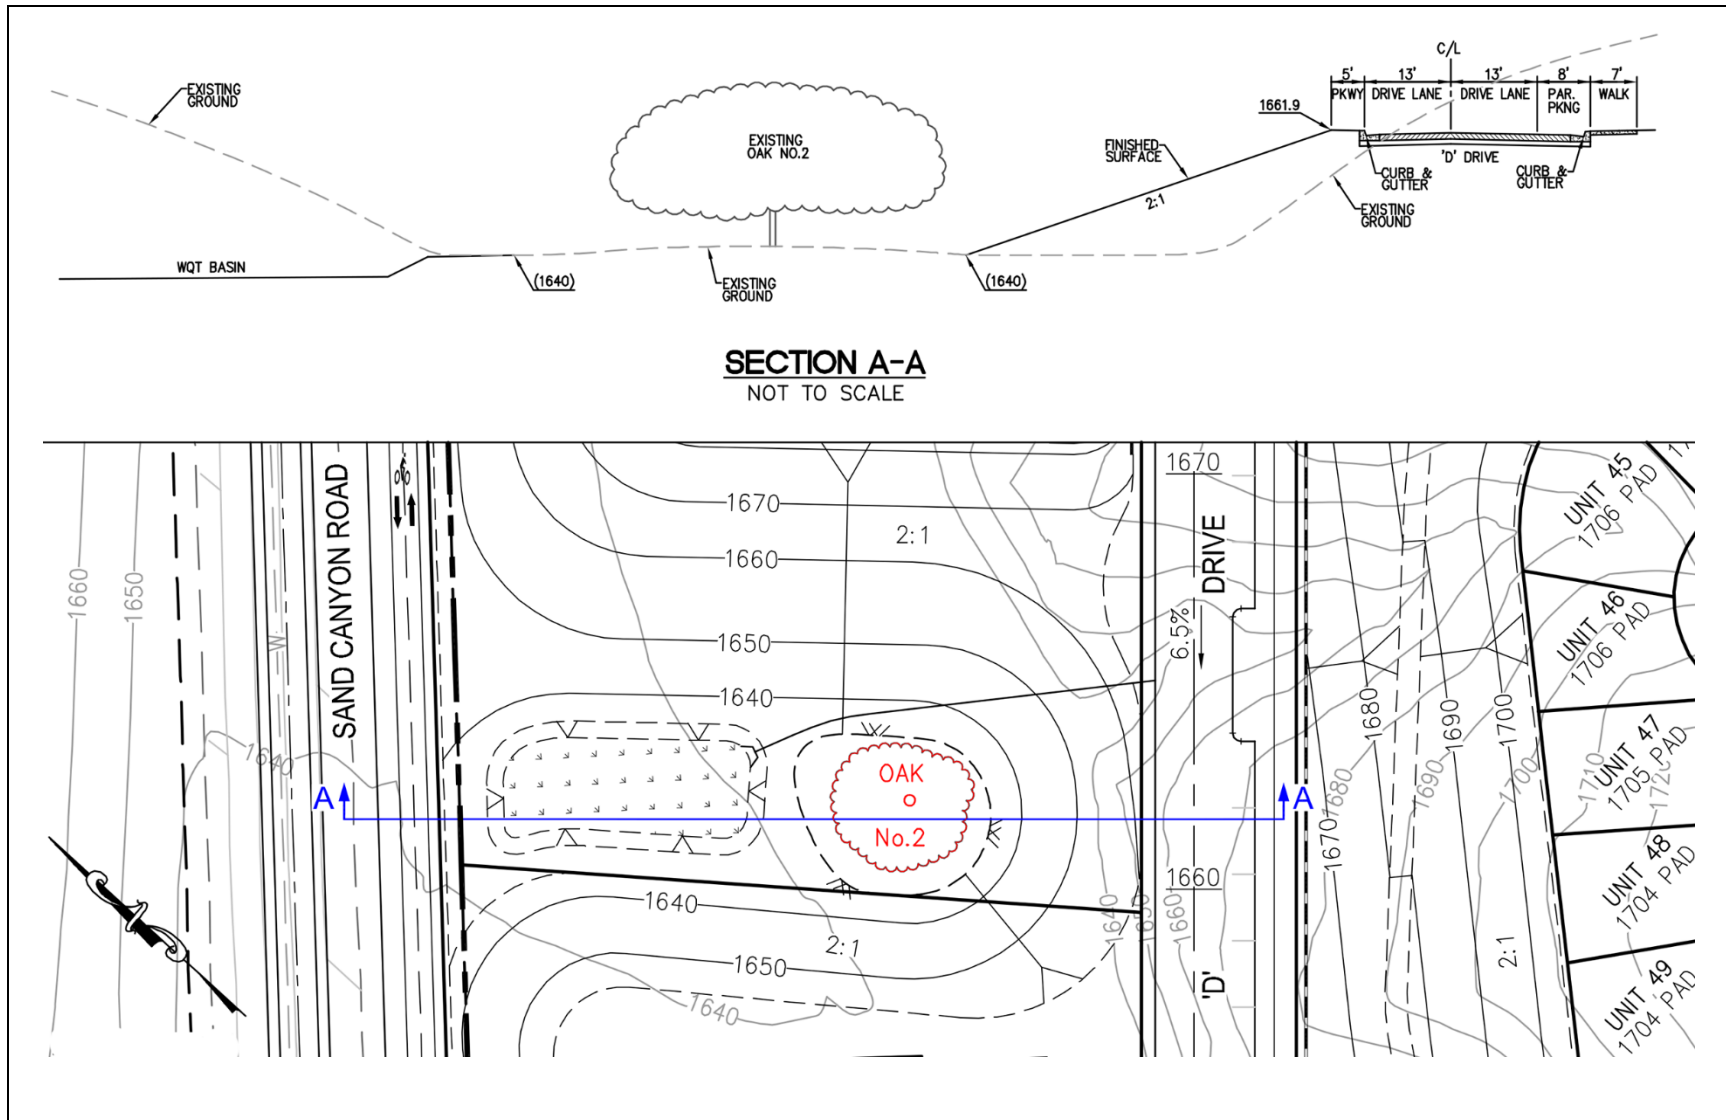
Oak Tree No. 2 Cross-Section
